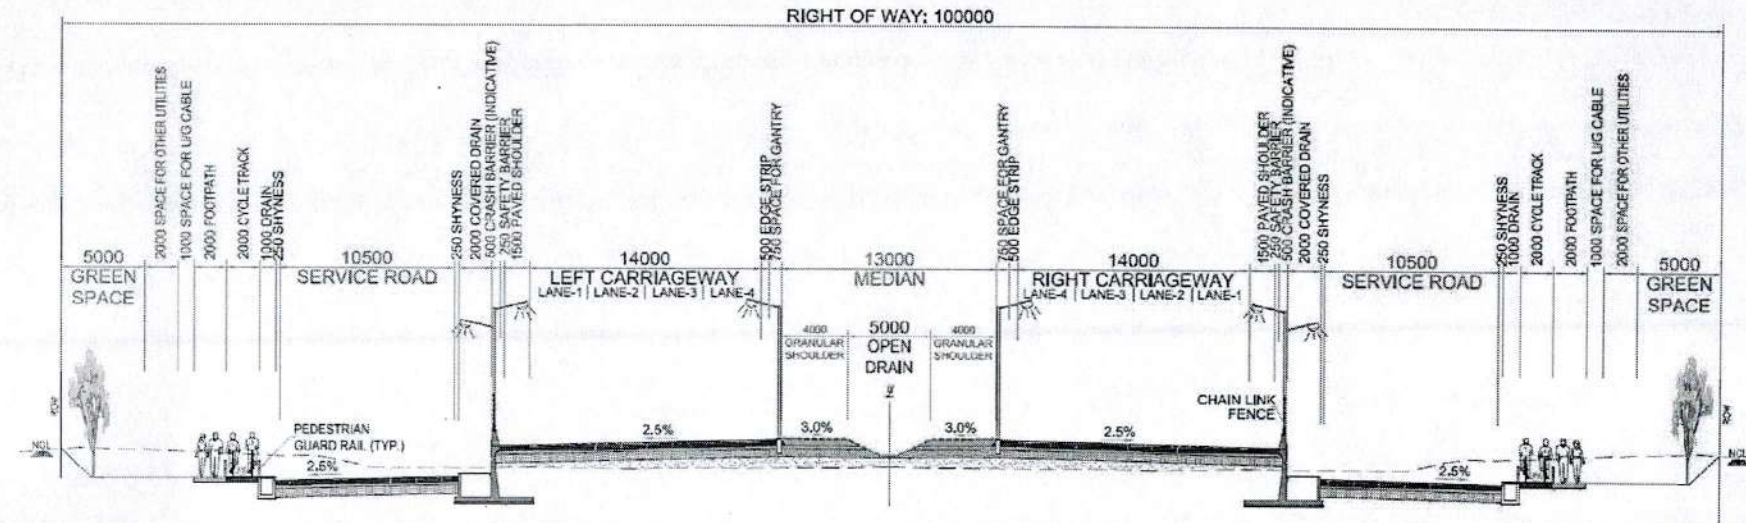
Typical cross section of PRR with Service Road lower than Main road
